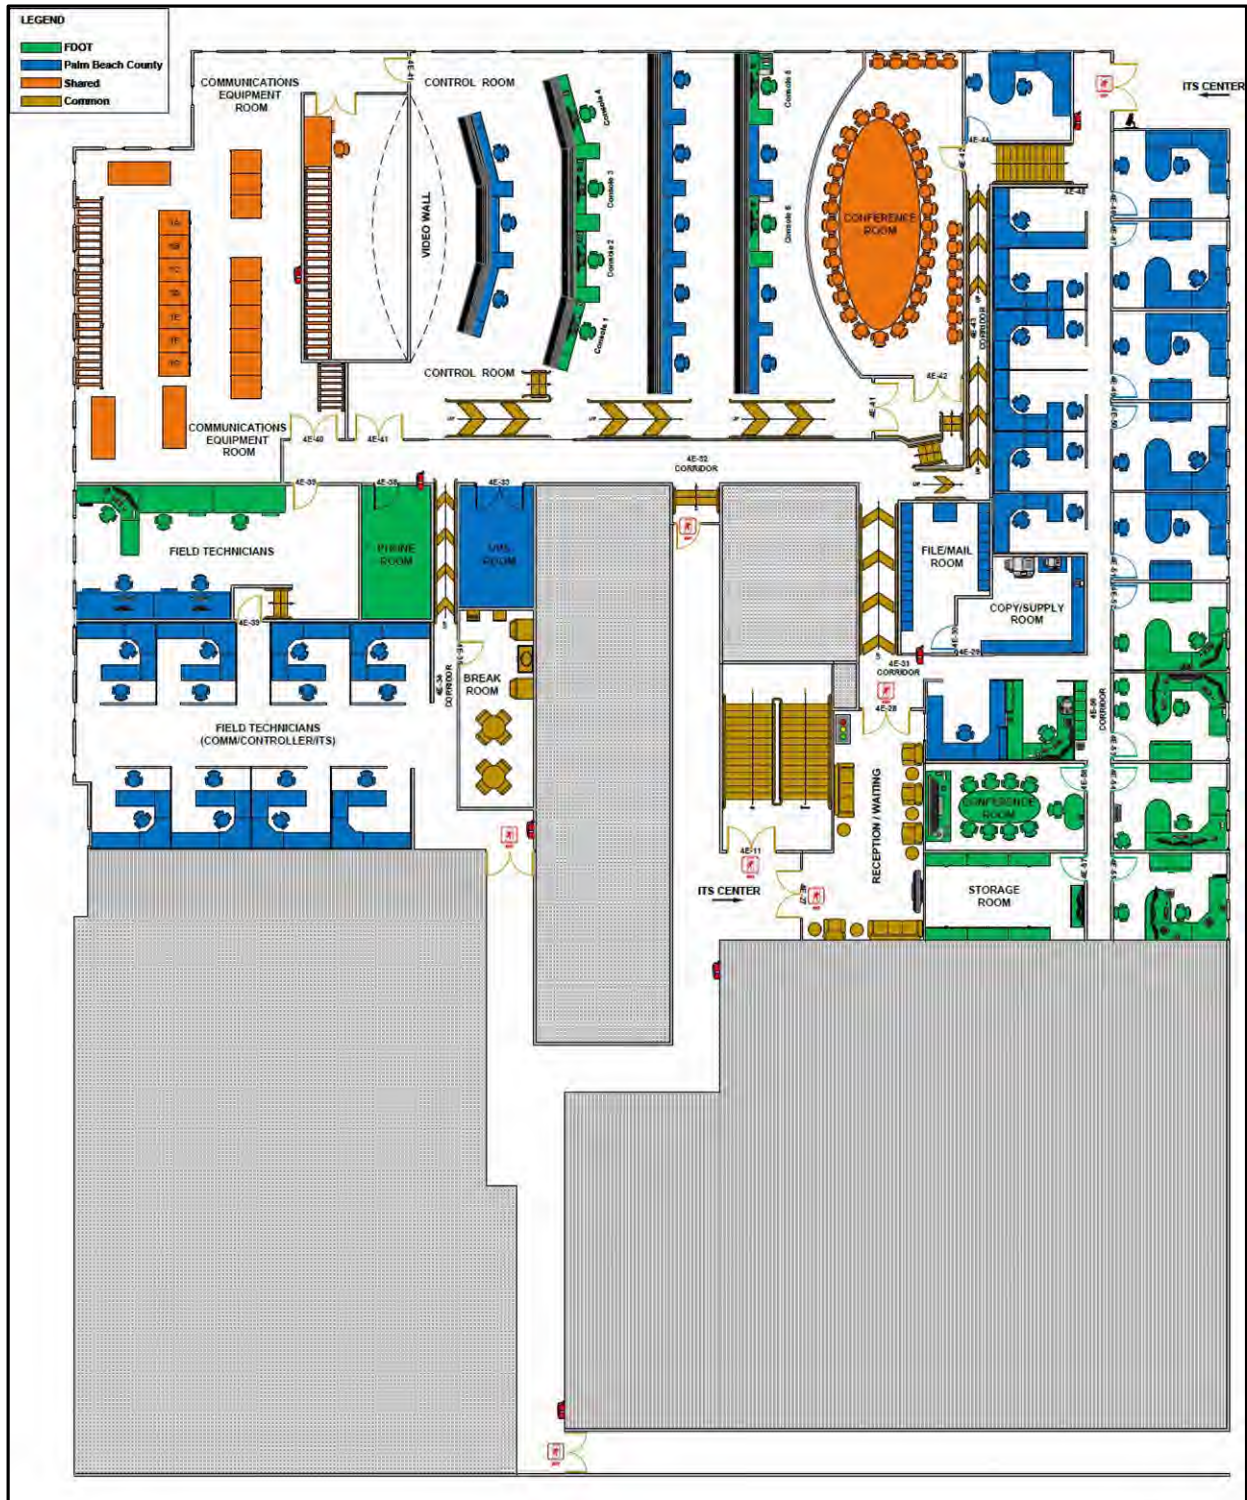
Palm Beach Vista Center TMC Floor Plan
